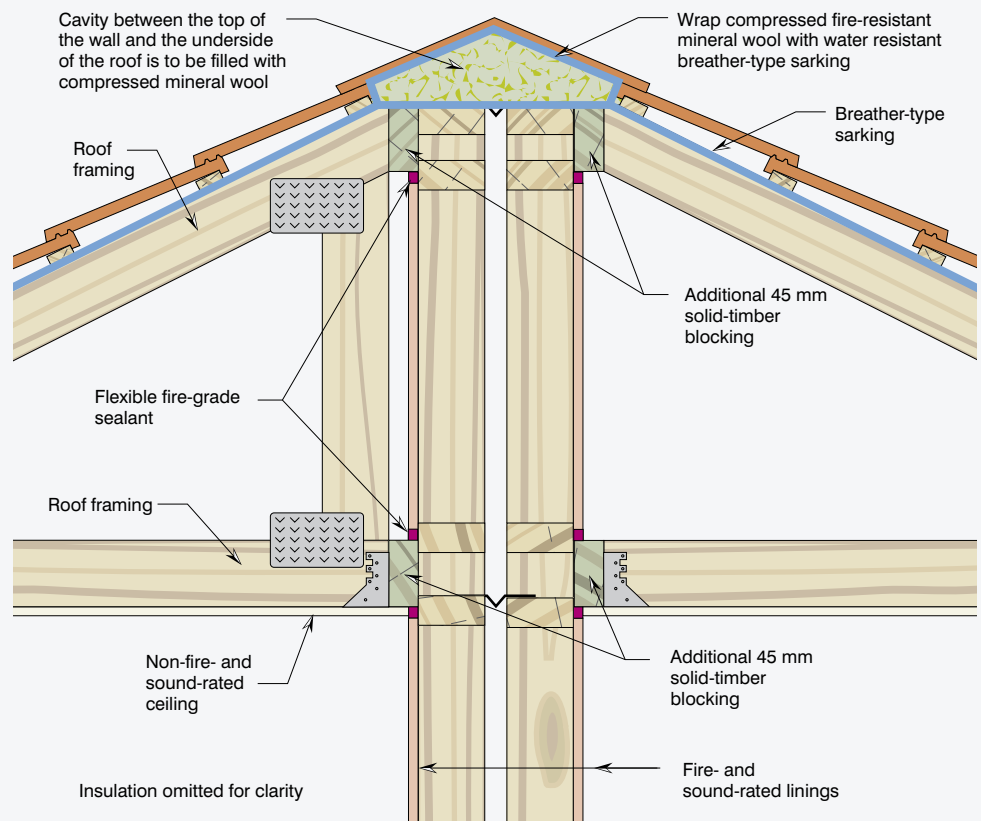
Timber blocks used to maintain fire-resistance – FRL 60 minutes in roof void – elevation view.
